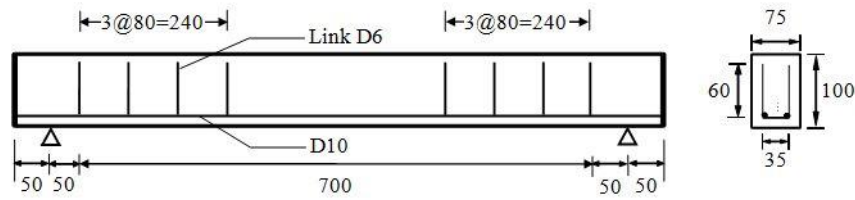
Rebar arrangement (a) side view (b) cross-sectional view
